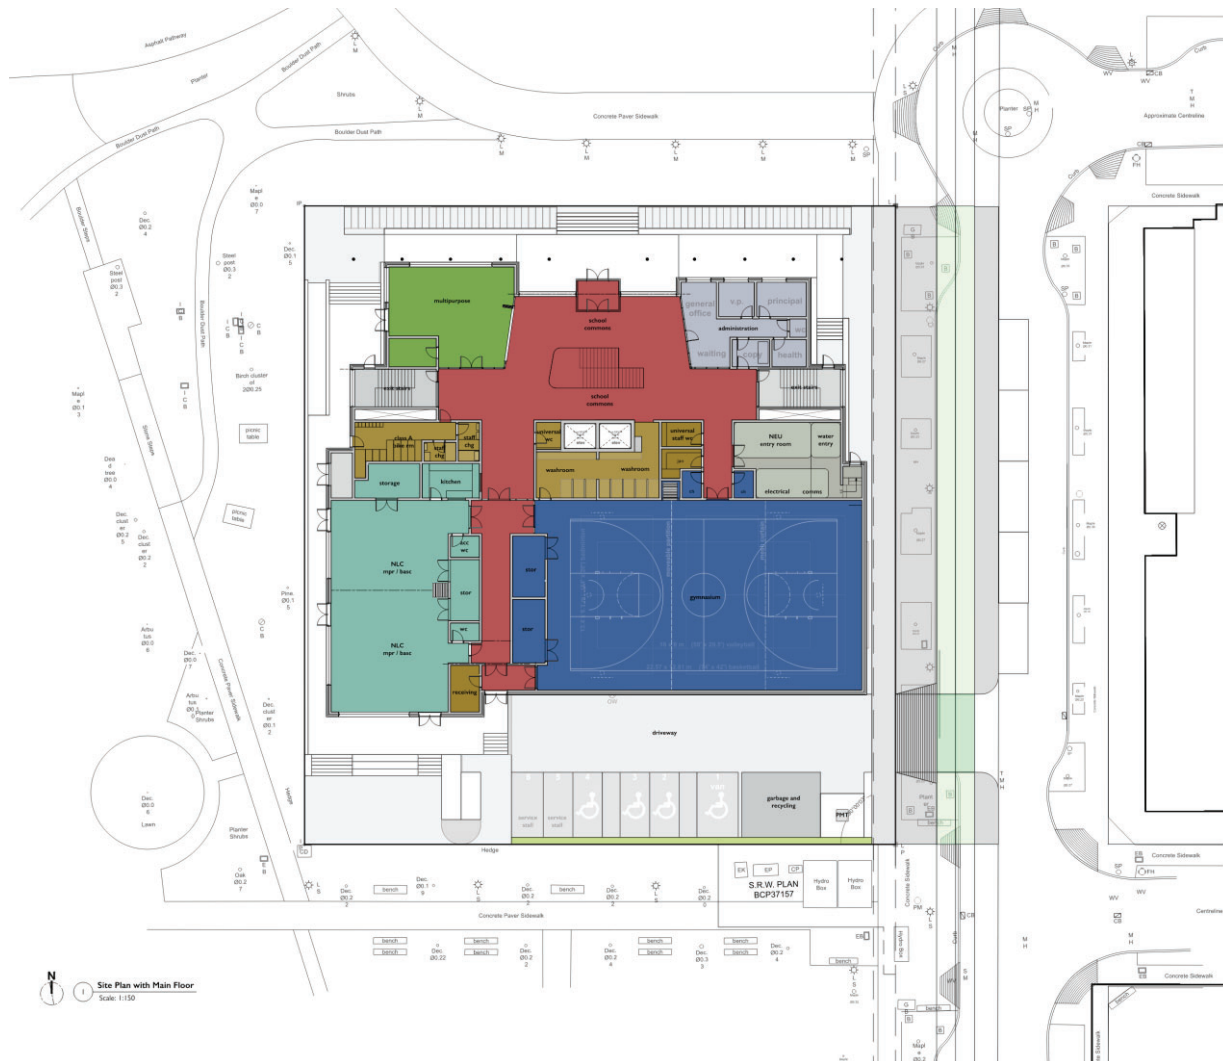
Concept Site Plan (Excerpt from Site Plan Provided by Architect Apr 08, 2025)
